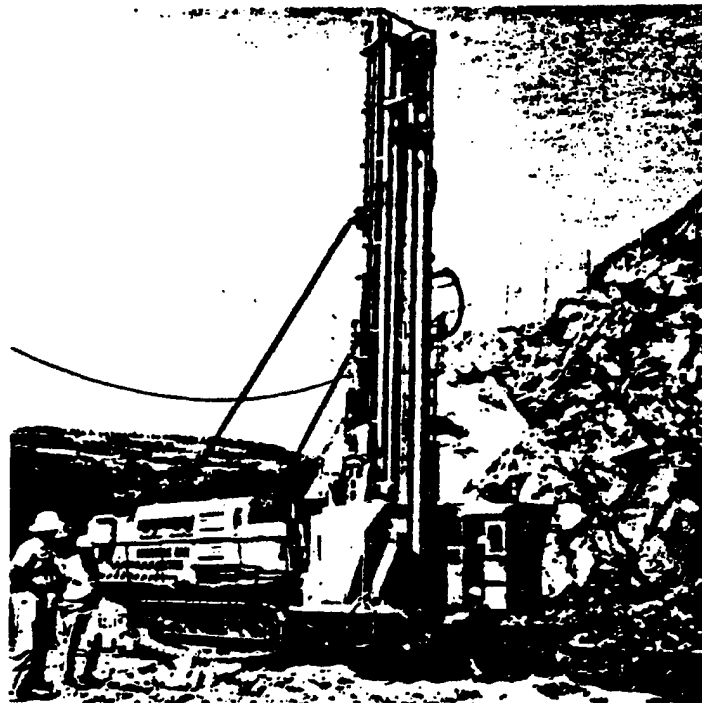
Track-mounted rotary drill (9-in. bit)
